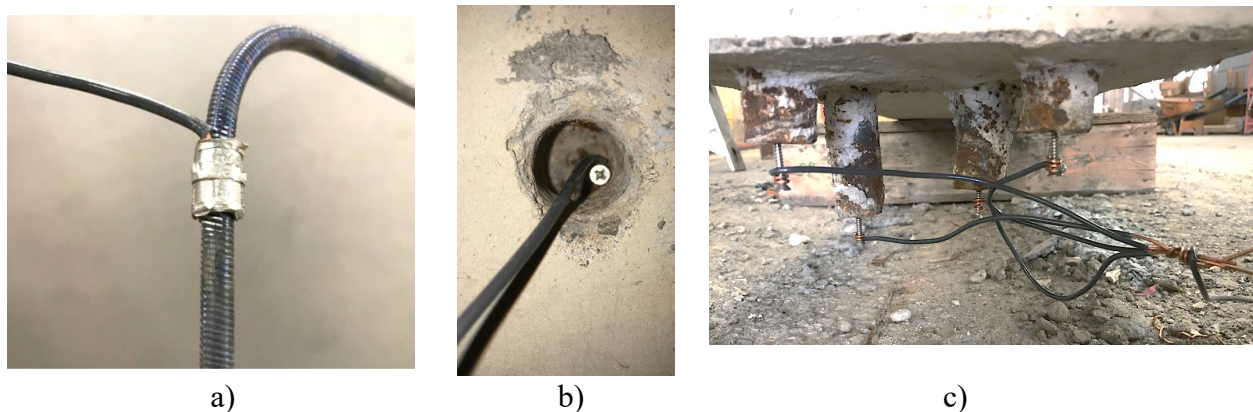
Examples of electrical connections for ICCP application a) #2 TiAB, b) Steel stirrup, and c) steel longitudinal steel.
